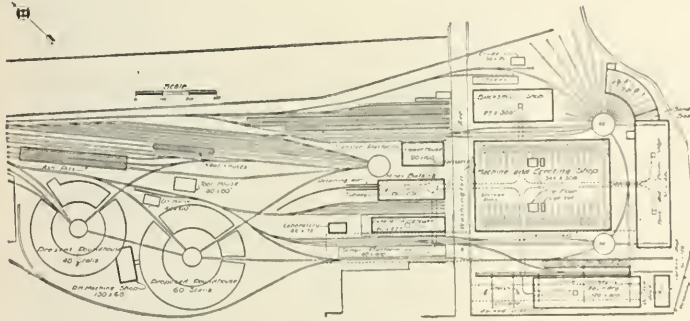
Proposed Arrangement, Superseded by Layout in Fig. 4.
